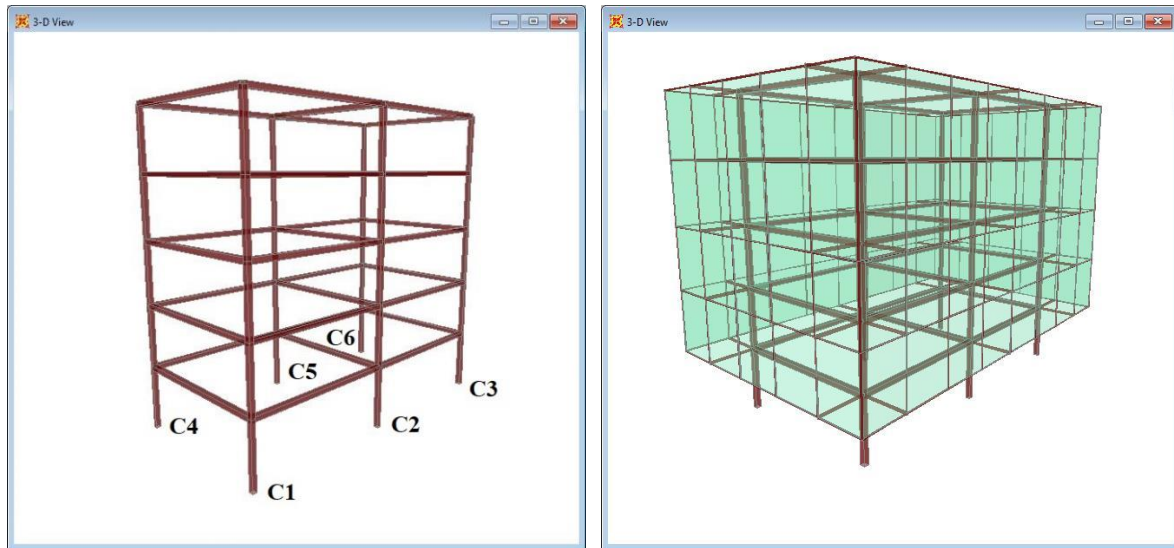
Configuration of main structural system of R-shape (Regular shape) with columns, beams, connection members, frames of glazing and curtain walls.
